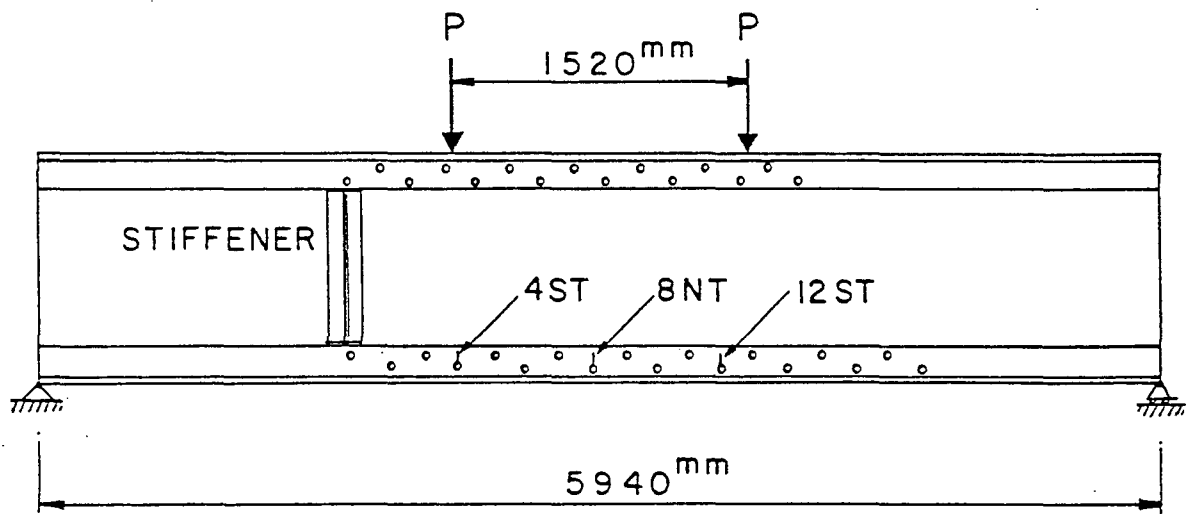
Details and Crack Locations of Riveted Floor Beam
